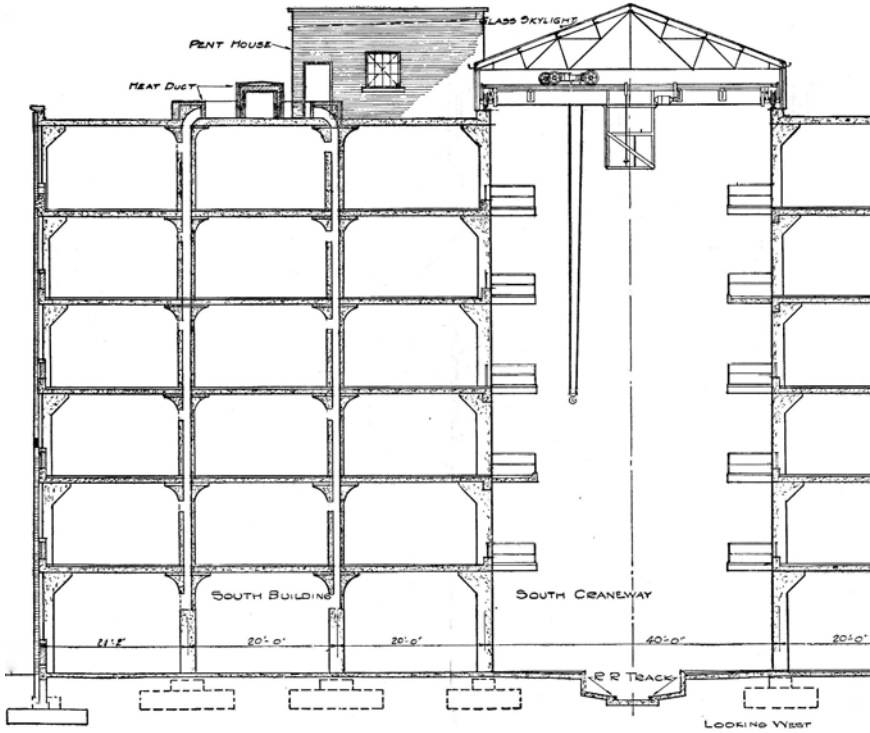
Cross section of Ford Highland Park six-story buildings, 1914
